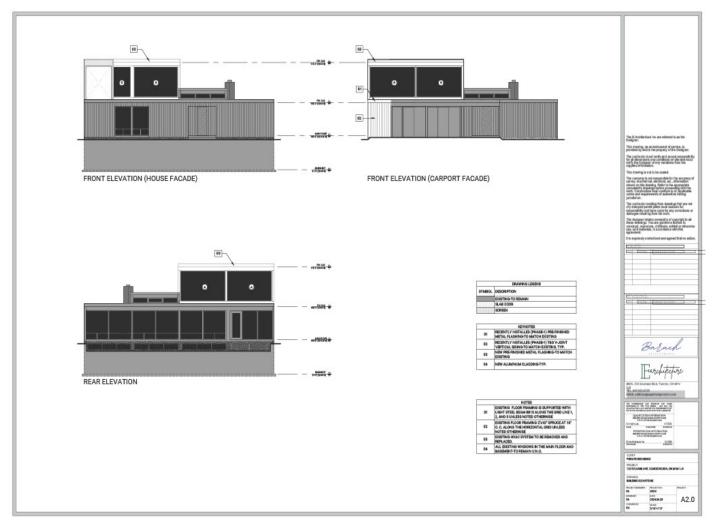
North and South Elevation Drawings (E- Architecture Inc., 2024).
